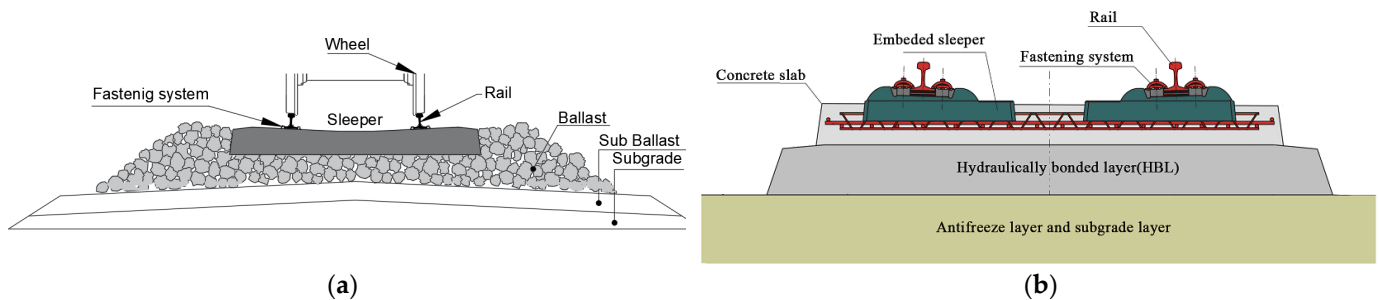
Schematic view of (a) ballasted track; (b) concrete slab track (reproduced from [5]).
